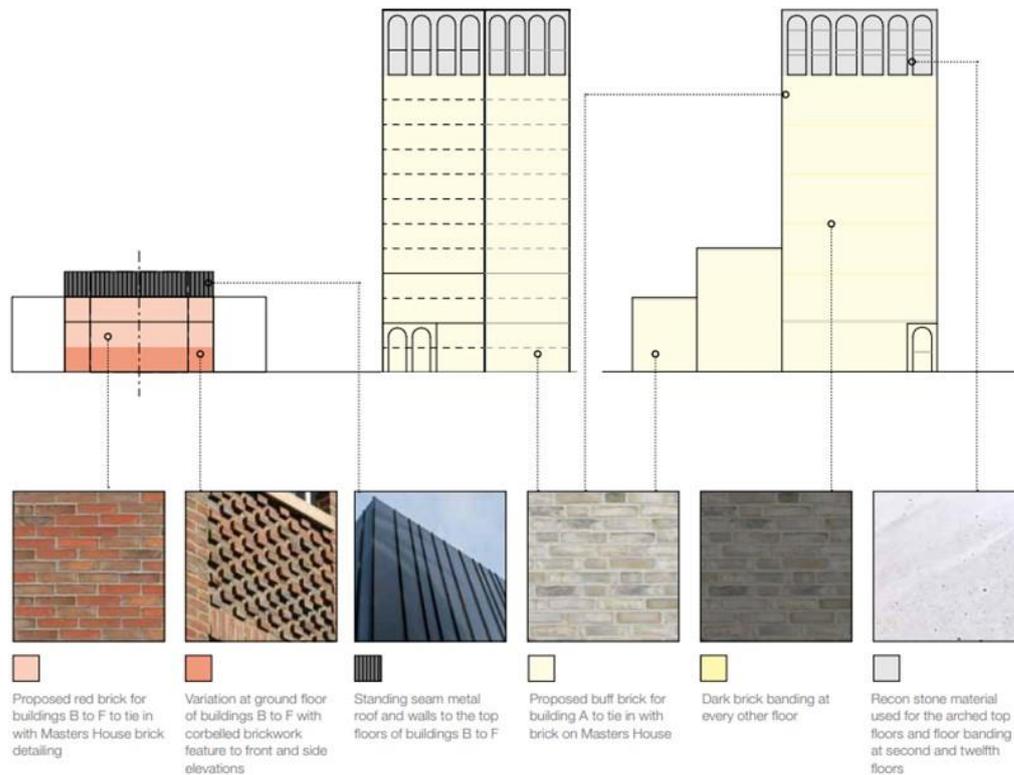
Illustrative view of Block A showing façade treatment and stepping down of mass
